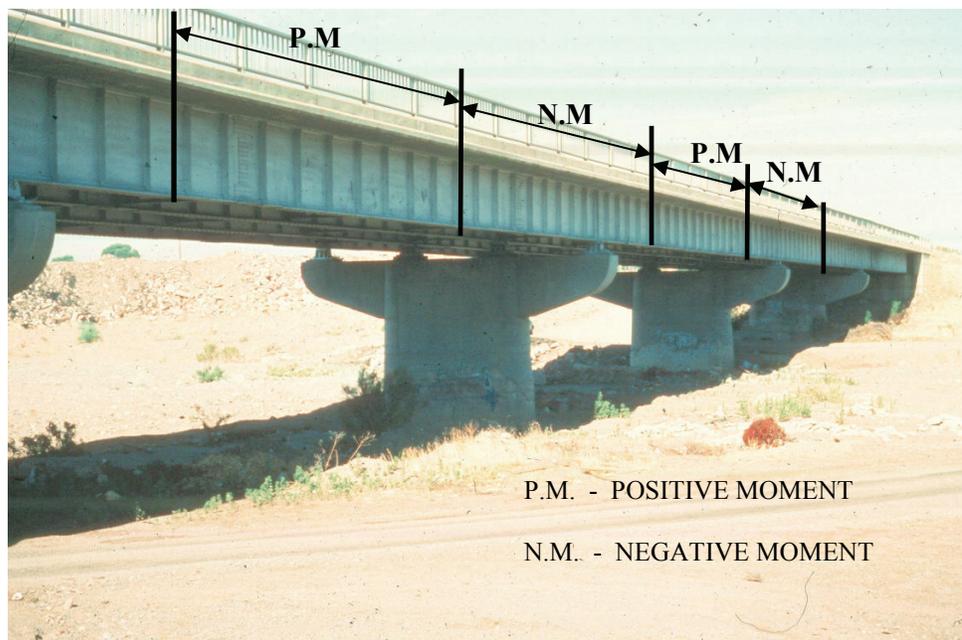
Flexural Zone on a Fabricated Multi-girder Bridge
